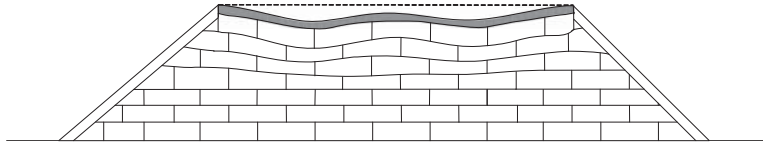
Load bearing failure of the EPS blocks resulting in excessive deformation.
